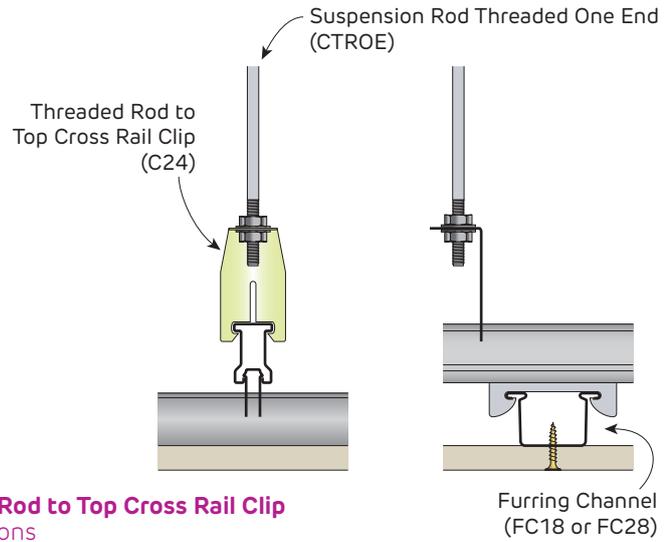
Threaded Rod to Top Cross Rail Clip
